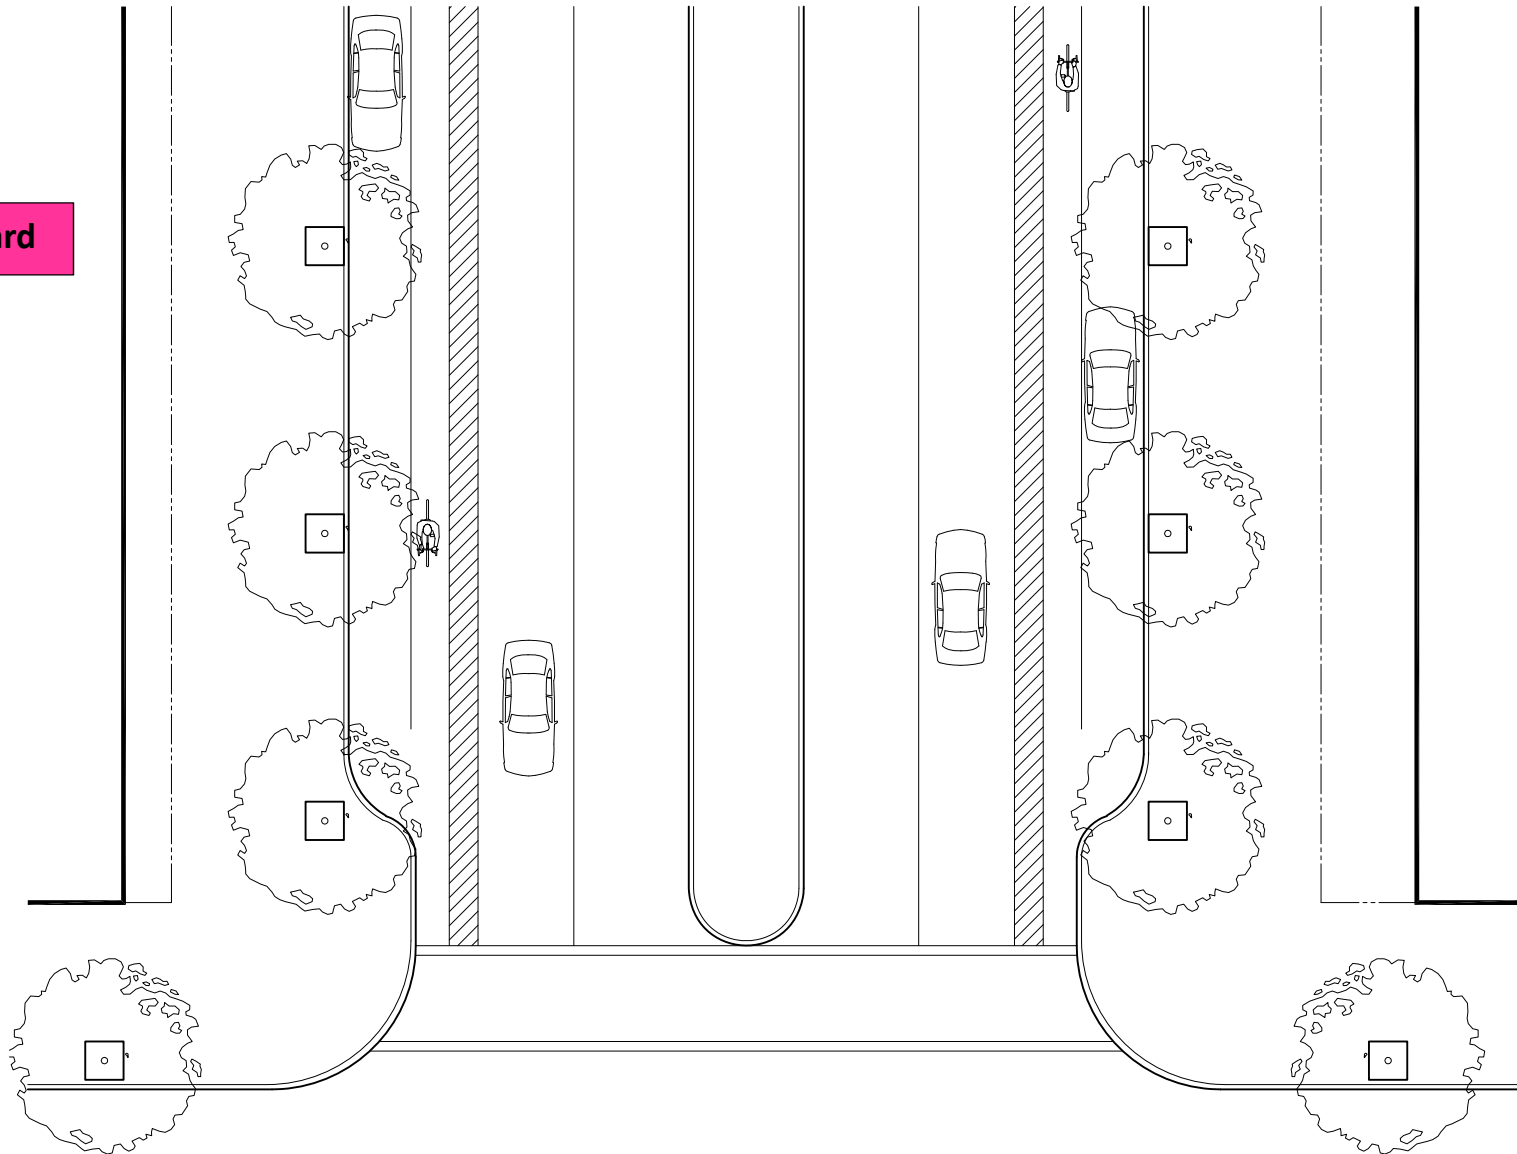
Street Type 5: Typical Intersection (Plan View)
